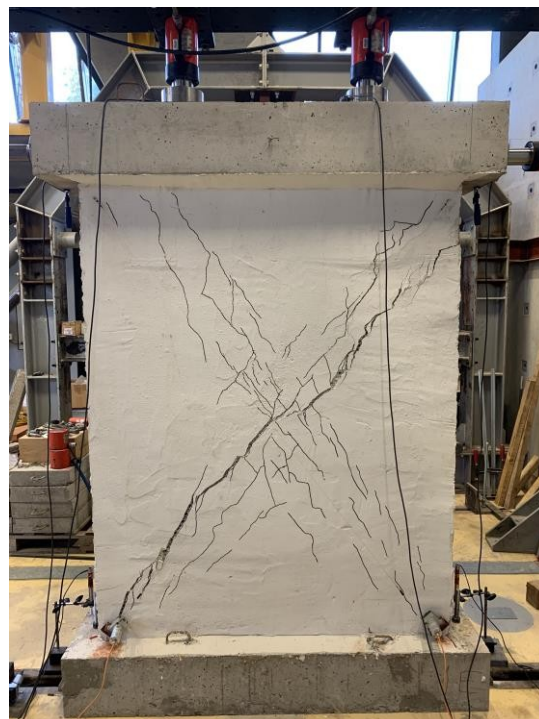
Final failure mechanism of FRCM 1 pier
